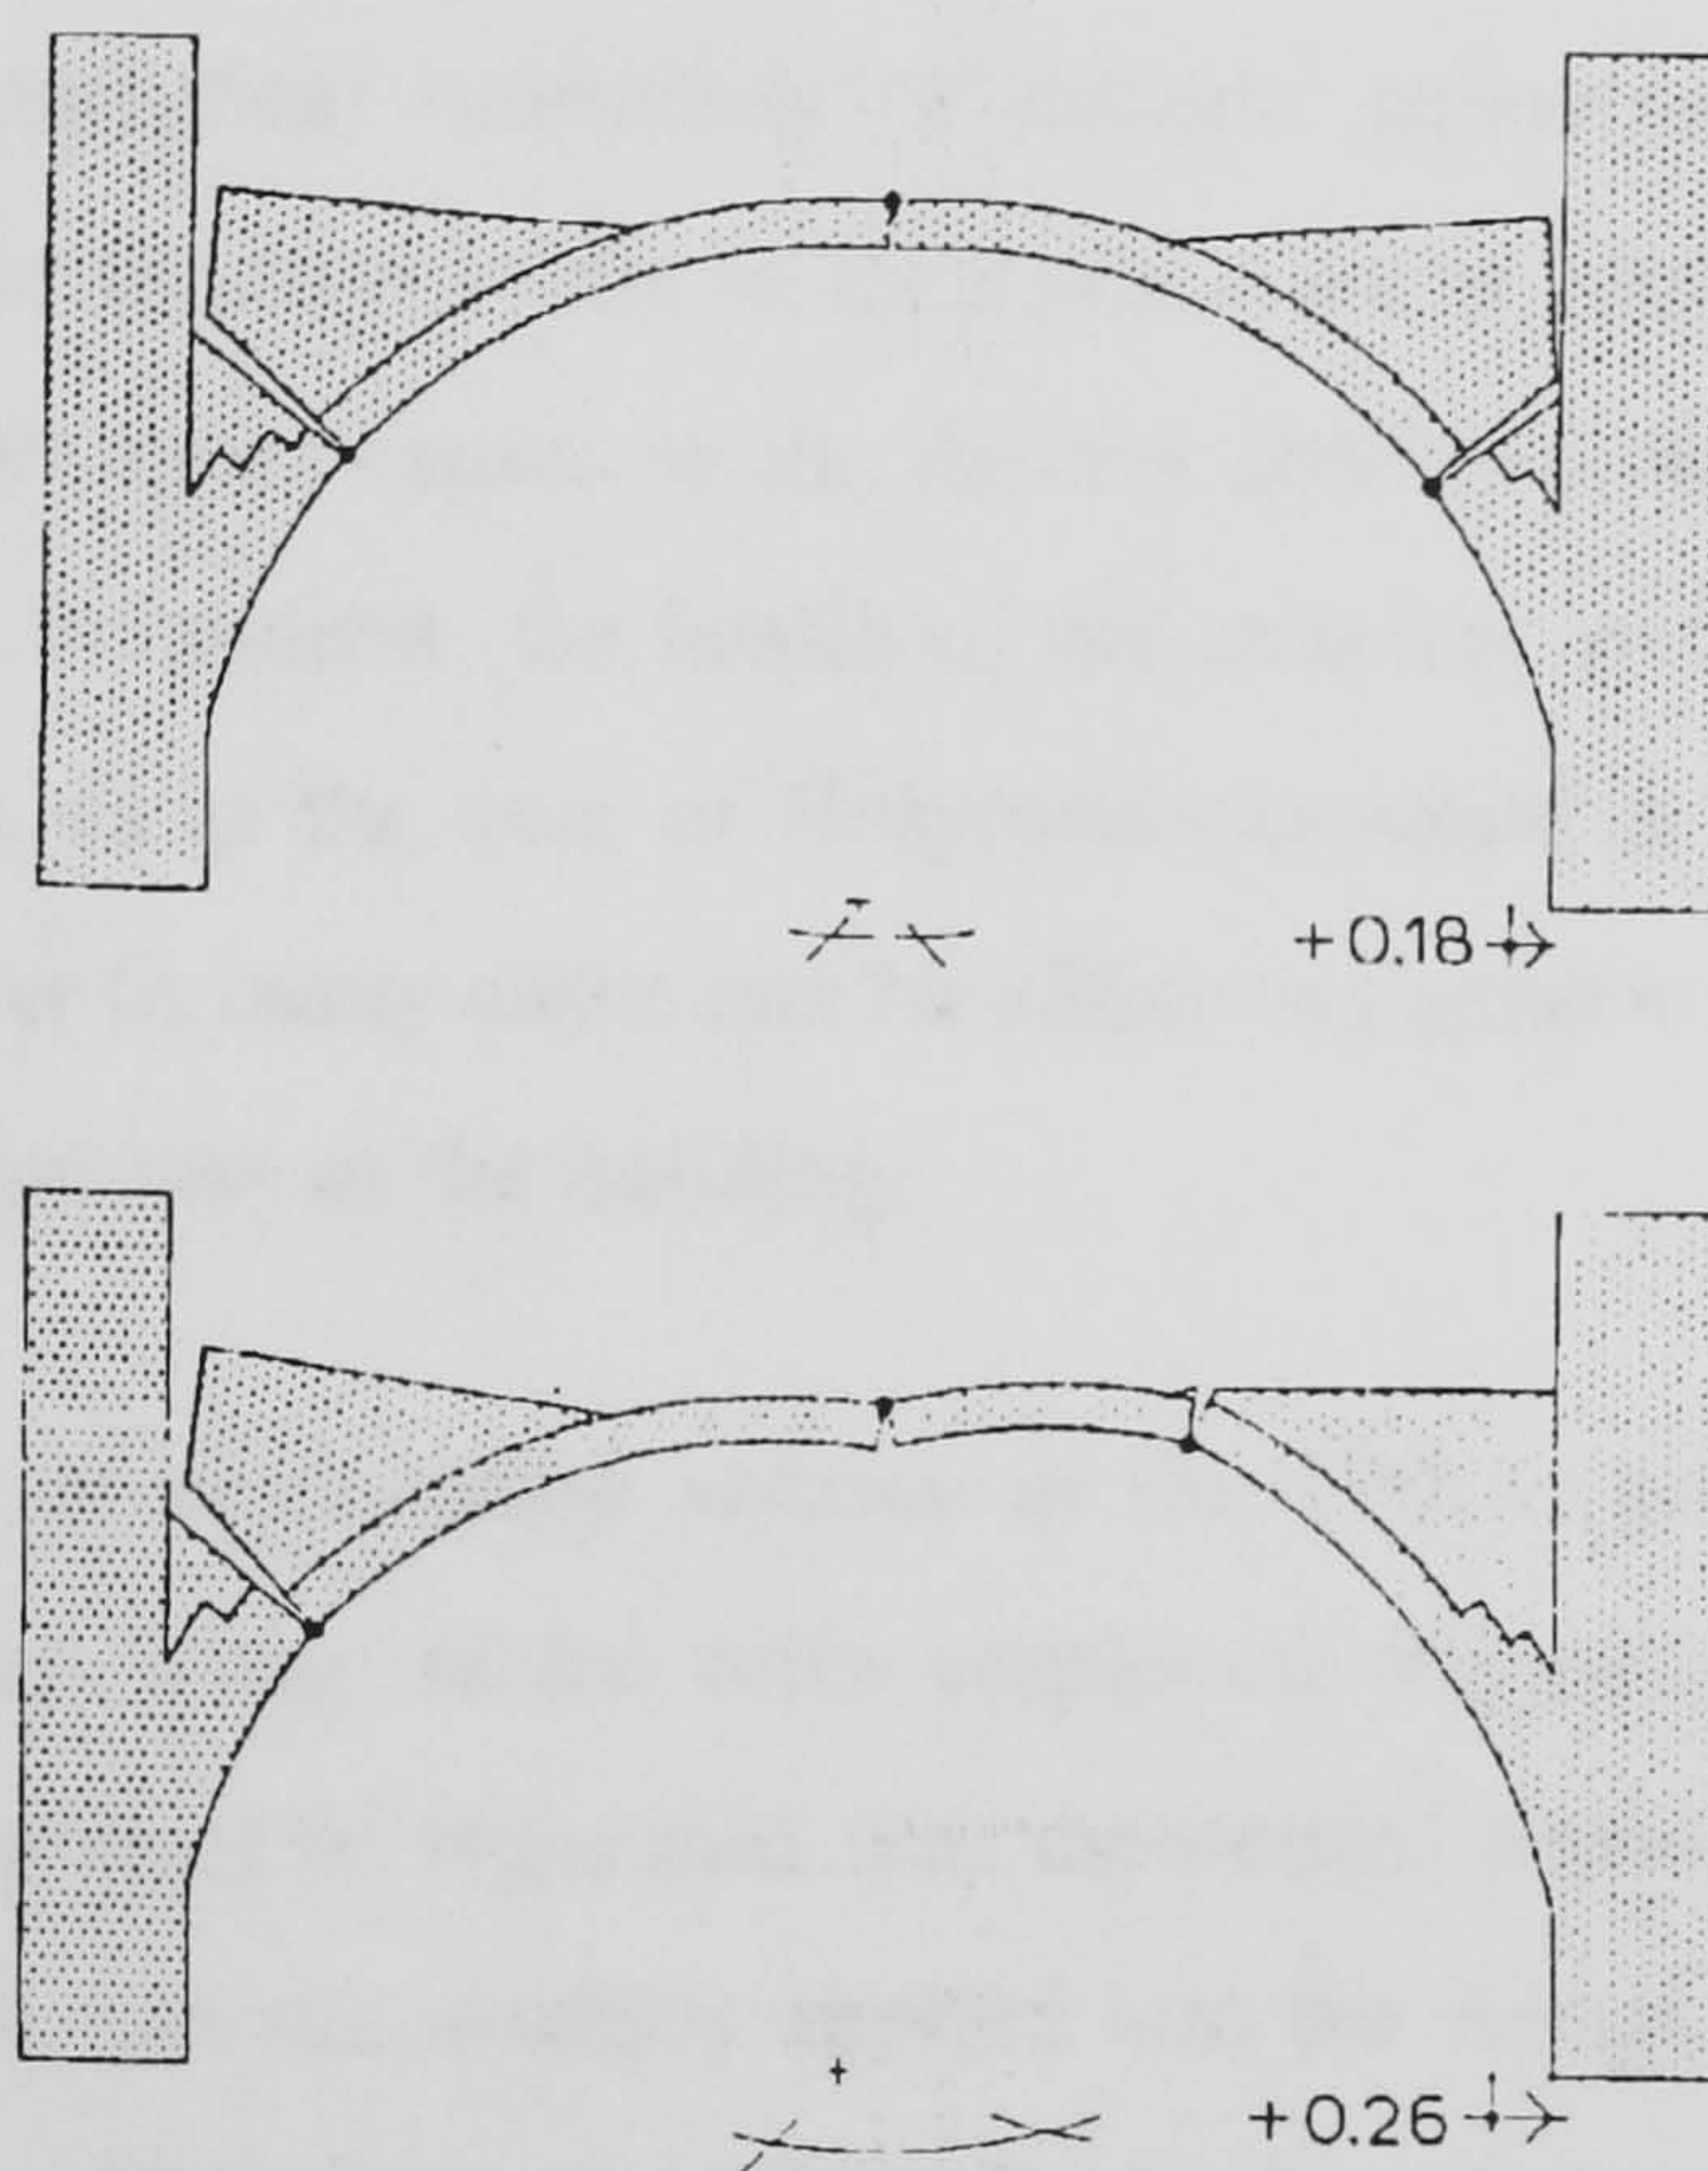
Crack pattern in brickwork cross vault after movement of abutments (Ortolani 1988)
